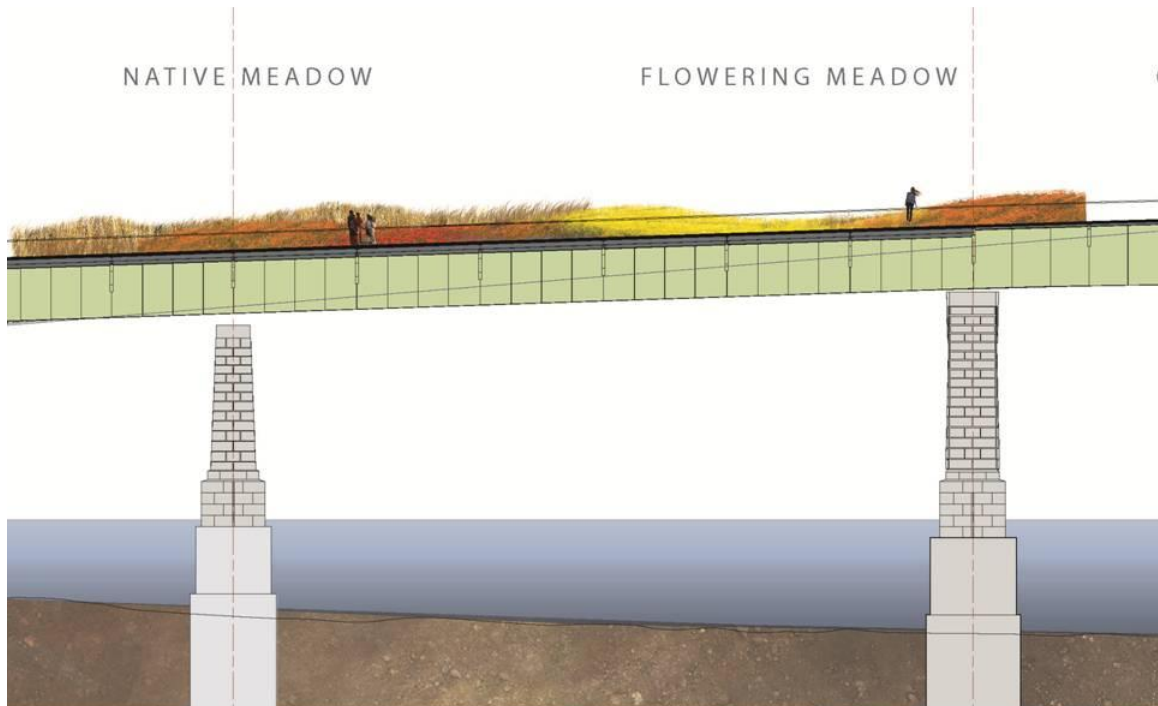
Riverpark Elevation of Native Meadows [Aroom]
